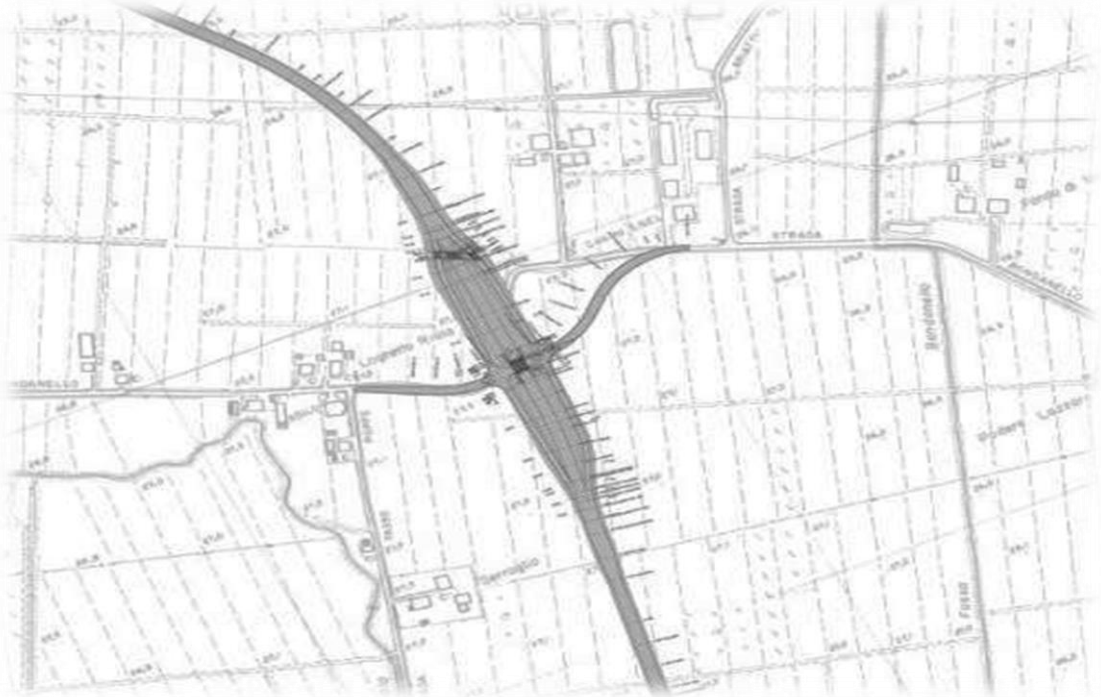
Project Plan 2: Intersection at Via Lirene
